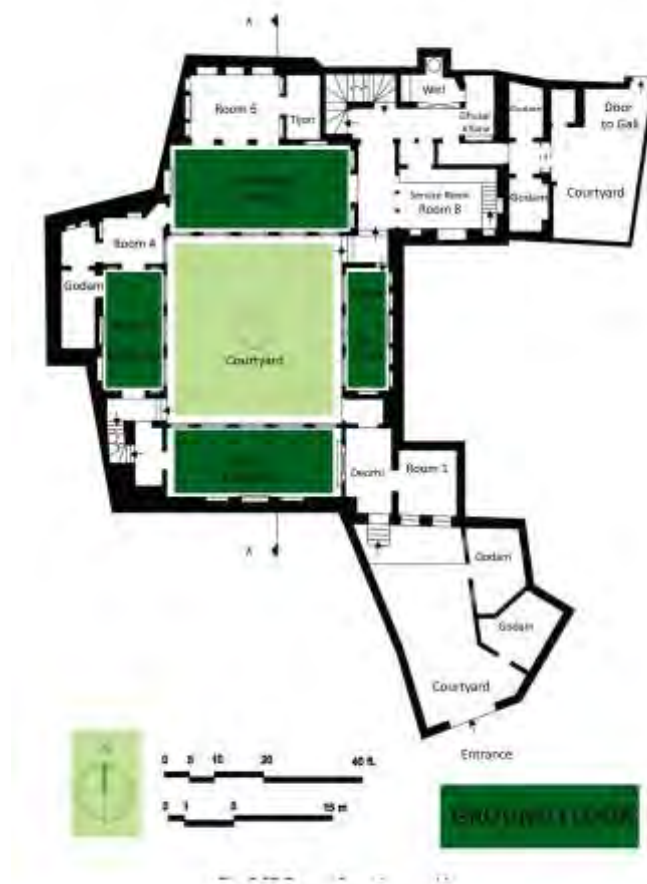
13. Detailed Plan of Ground floor. By Khan and Saleem
